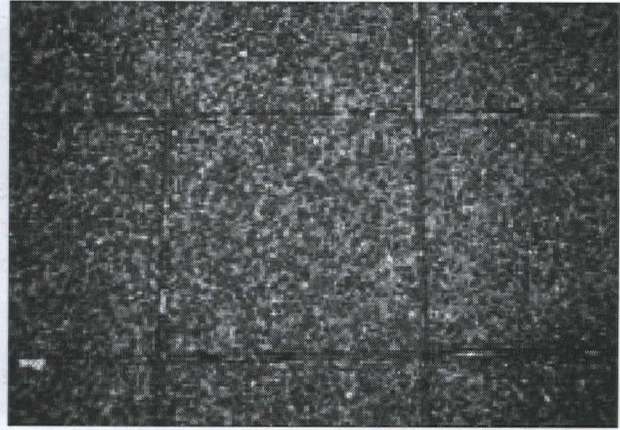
Original pavement walkways on the mall are crushed black trap with 5-10% beige, 1997, see plan sheet 33 (Land Ethics, Inc.).
